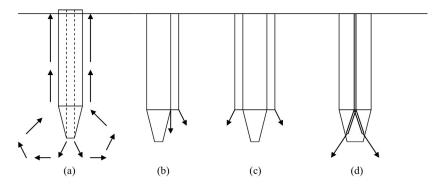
Water jetting. (a) Internal water jet pipe is shown here. Internal water jet pipes can be installed only in concrete piles and steel pipe piles. (b) External jet pipe attached to the side of the pile is shown. This is the usual procedure for timber piles. (c) Two jet pipes attached to opposite sides of the pile is shown here. (d) Internal jet pipe with two branches.
